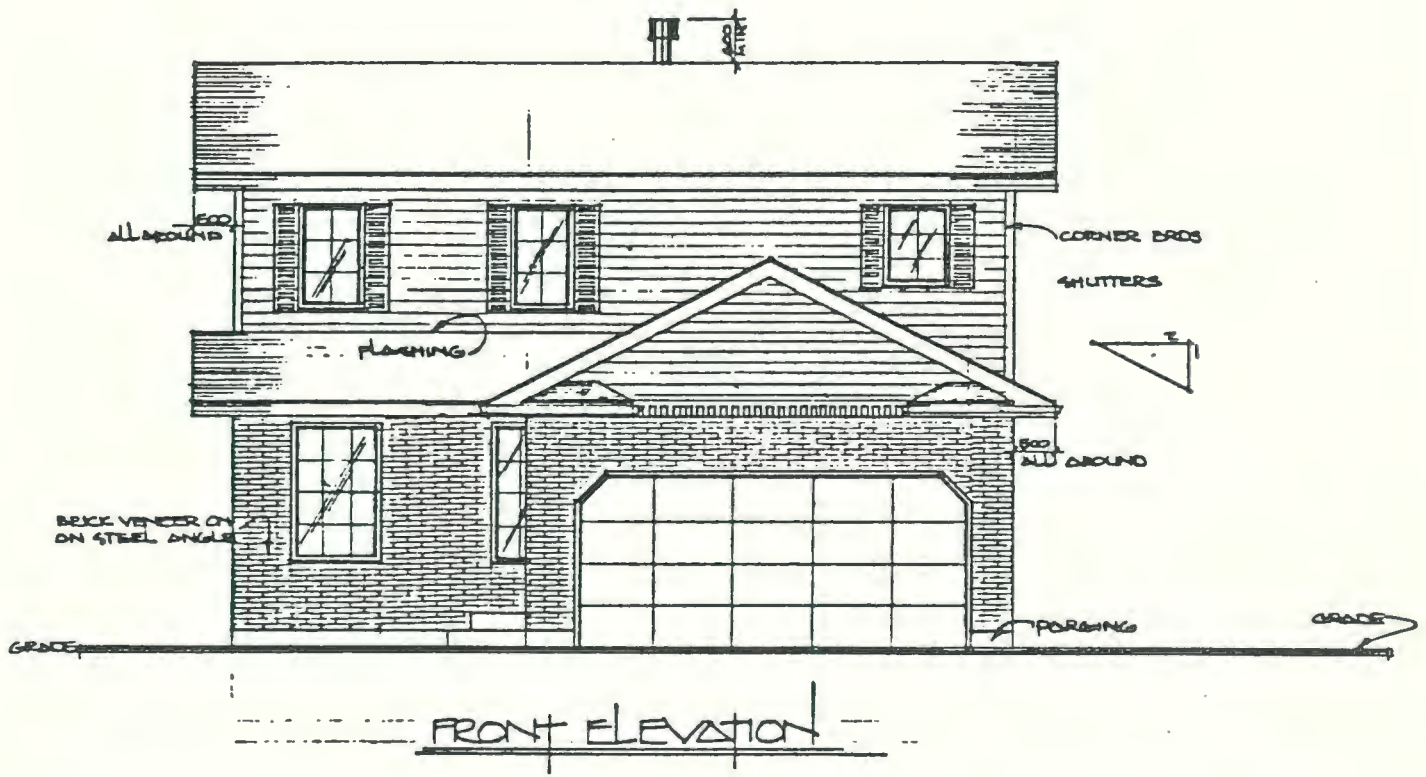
Typical Elevation - Proposed Alberta Demonstration House
